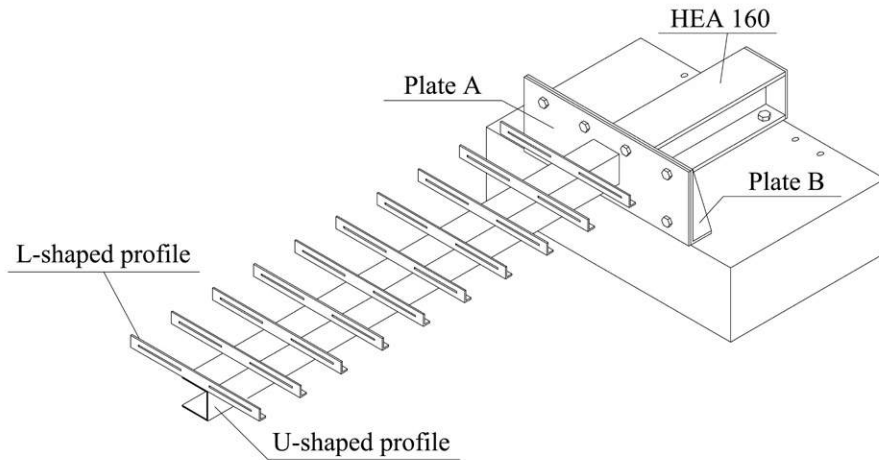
Scheme of the test on a thin-walled U-shaped section steel beam.
